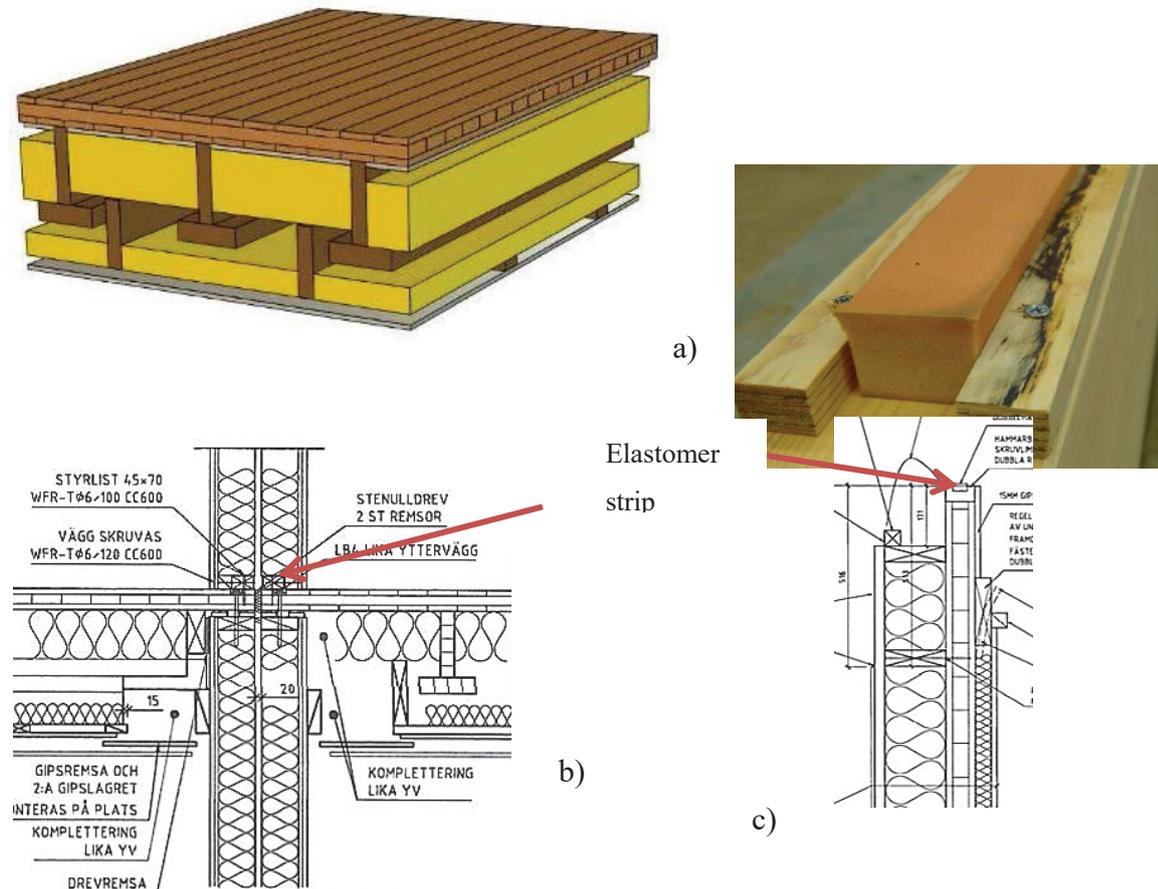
Elastomer flanking couplings for decoupling of the floor from the supporting structure, type A: a) Separate CLT floor and ceiling. Elastomer strips loaded by the floor cassette. b) Coupling for apartment separating walls. c) Outer wall with a CLT load bearing wall plate and a radiation protection isolating layer.
